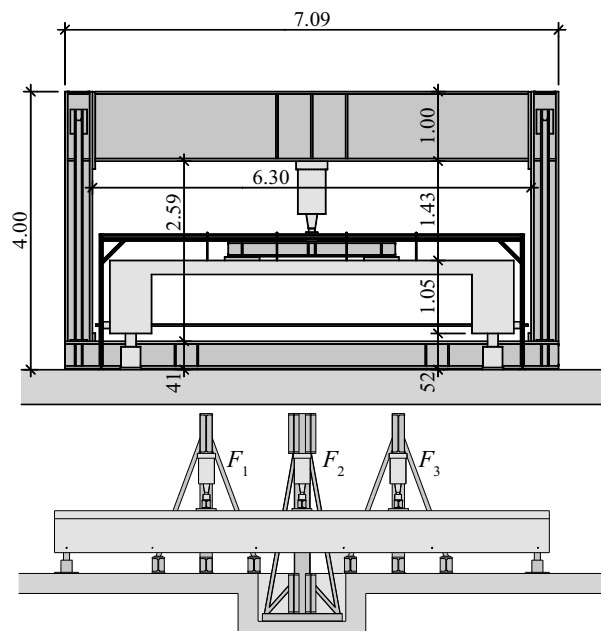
Top: Cross section; bottom: longitudinal section of the experiment set-up
